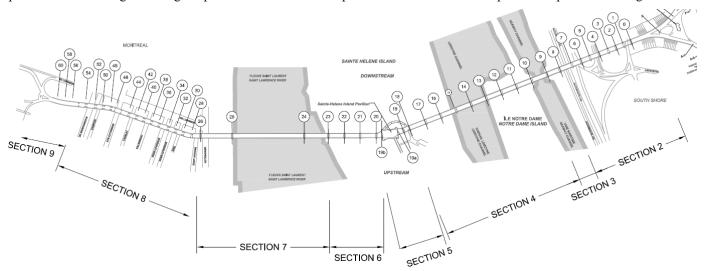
Plan view of Jacques Cartier Bridge - Section 1 to 8
